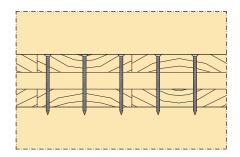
reinforcement of bearing area Source: Trada GD10; Redrawn by the author
